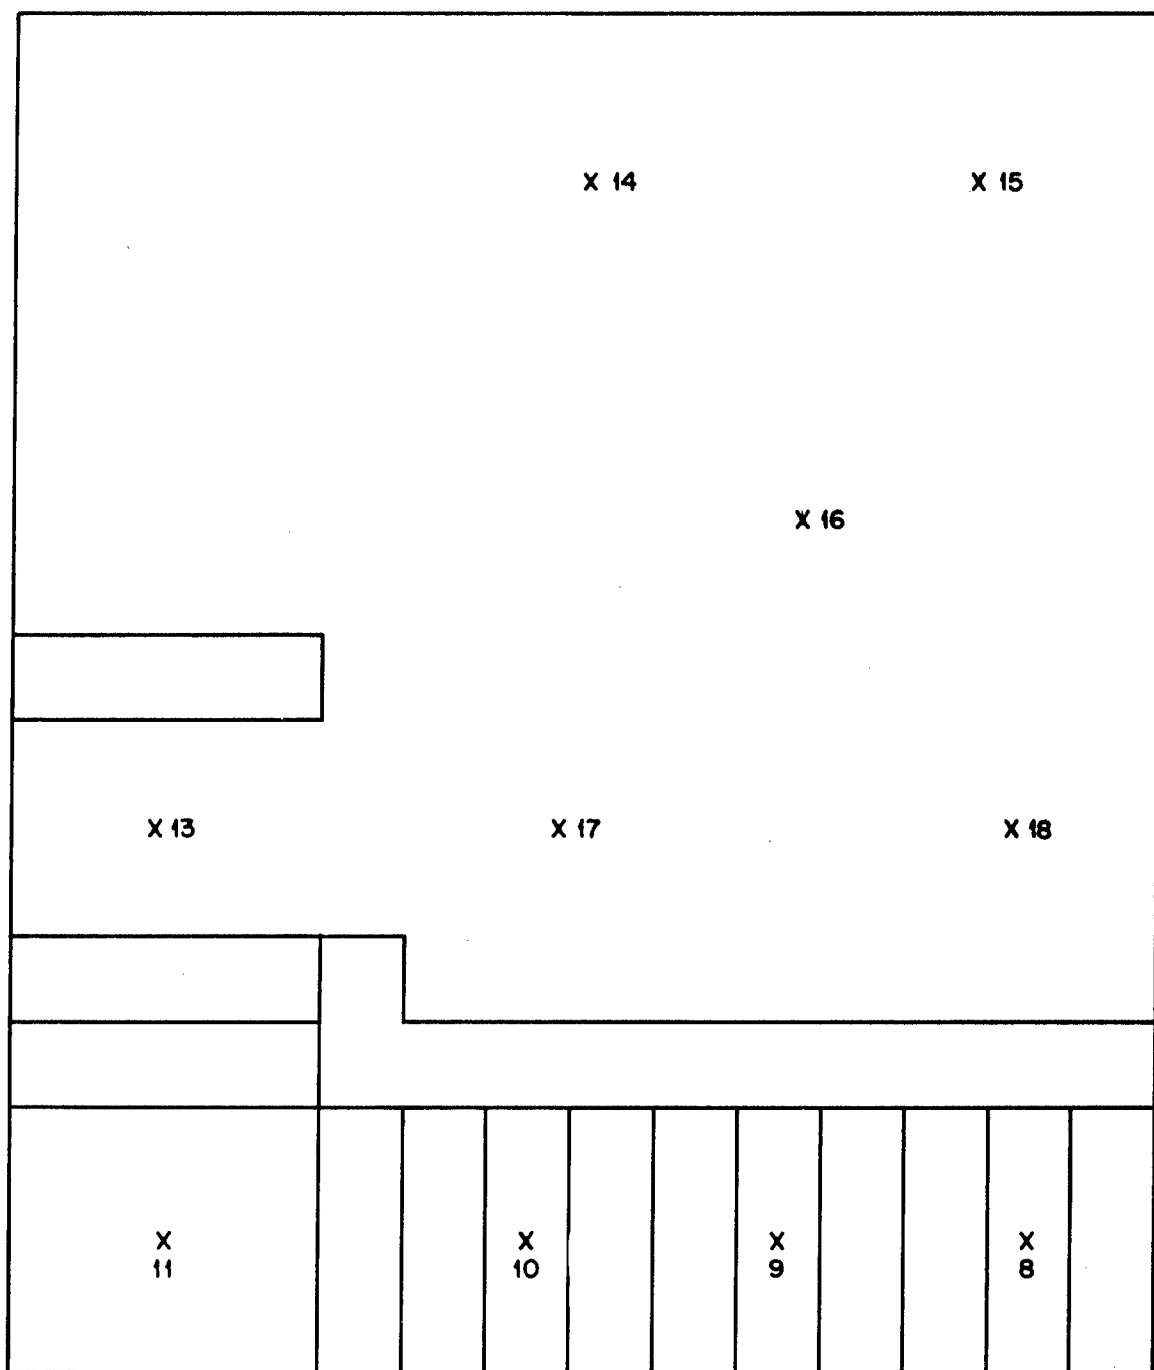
Approximate floor plan of home fallout shelter showing detector positions.
